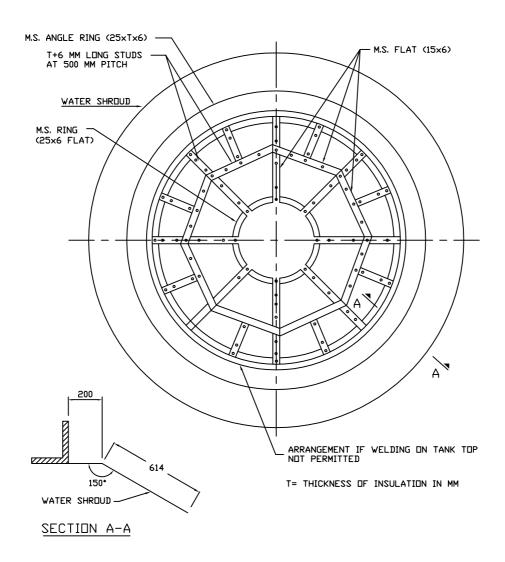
DETAILS OF TANK ROOF INSULATION SUPPORTS
